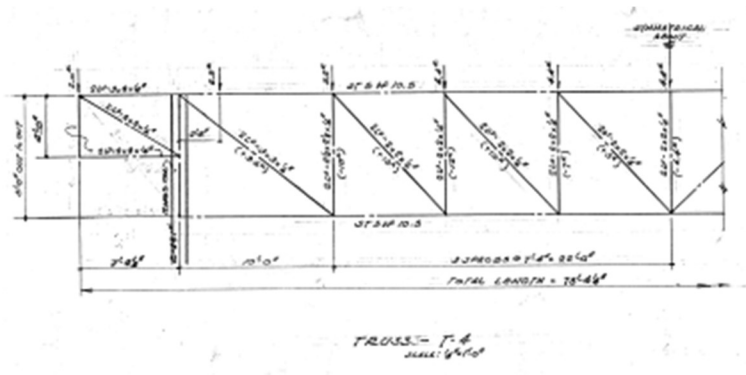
Truss T-4 Profile from CFAC Roof 4.
